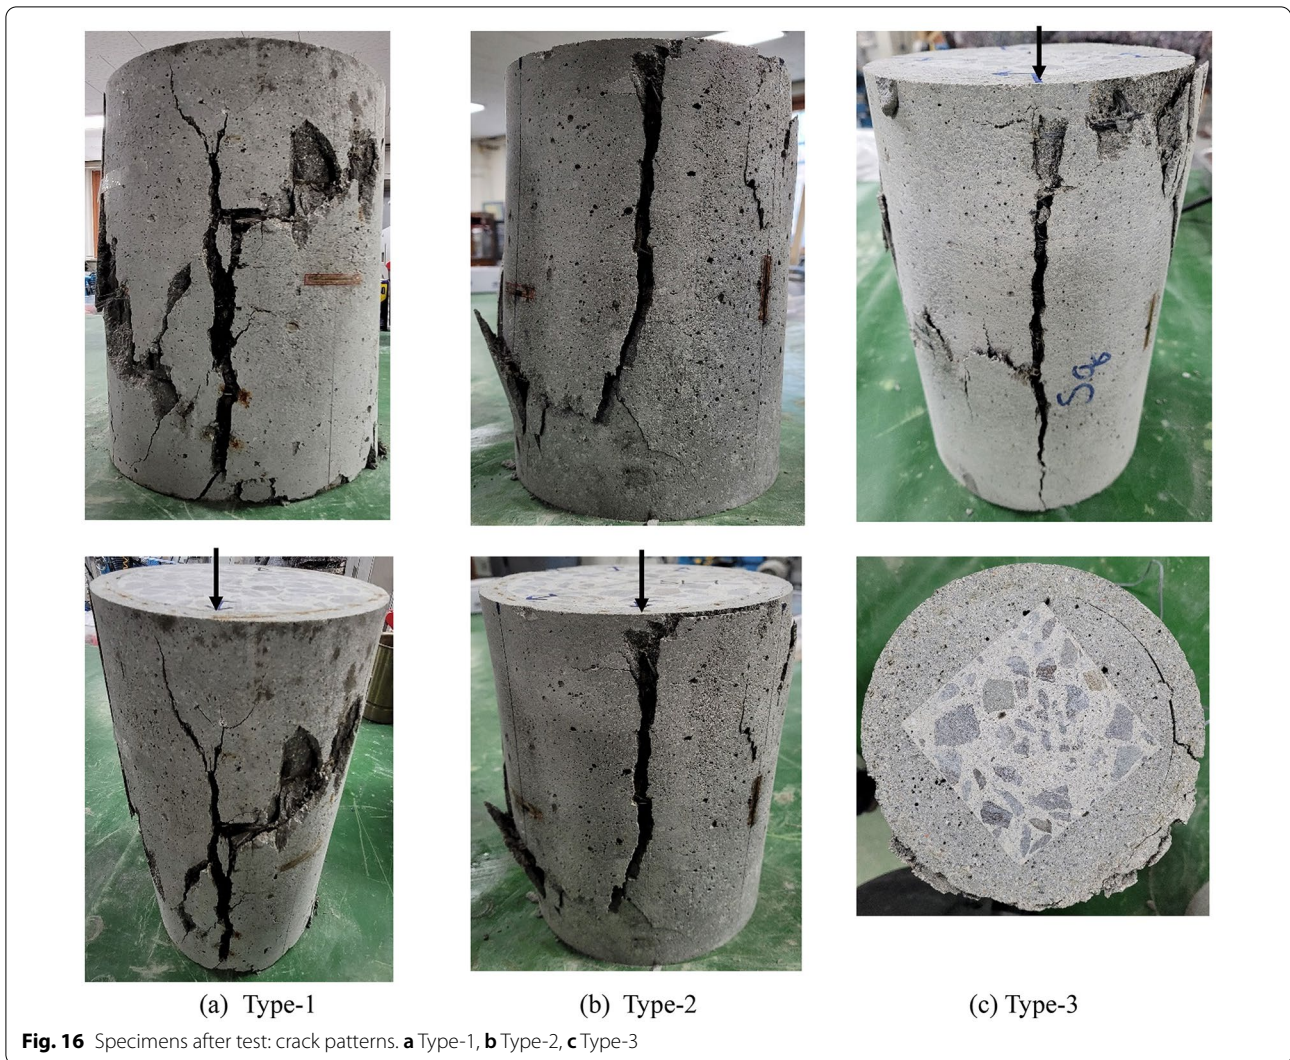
Specimens after test: crack patterns. a Type-1, b Type-2, c Type-3
